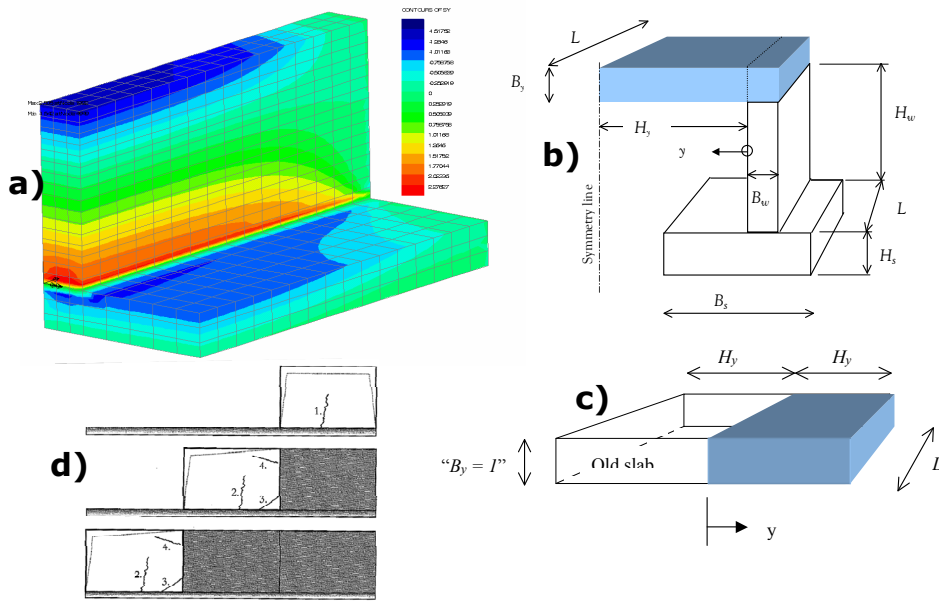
Examples of different conditions of external restraint: Wall on slab (a), slab on wall (b), slab against slab (c) and successive casing of wall sections (d). [116]
